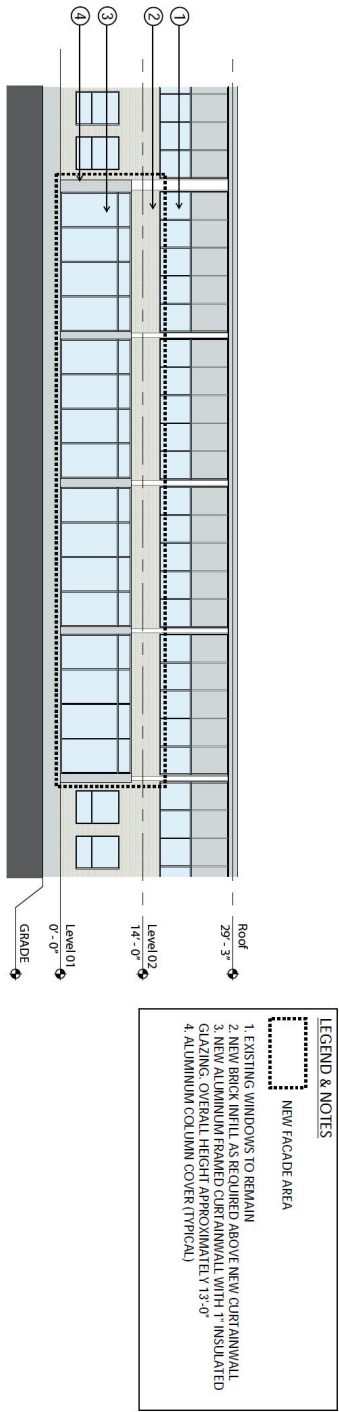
BUILDING 8 SOUTH ELEVATION
